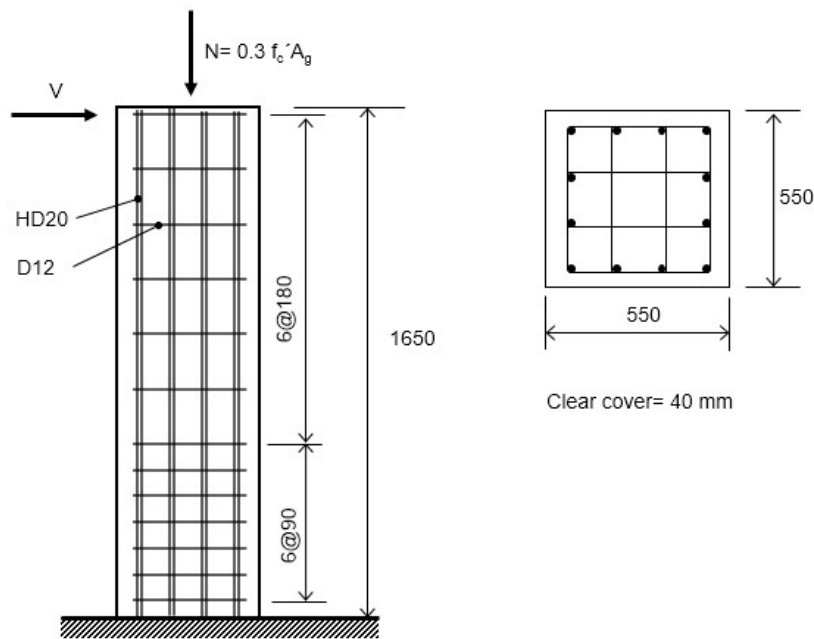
Specimen 7 tested by Tanaka [20], [21]. Dimensions in mm.
